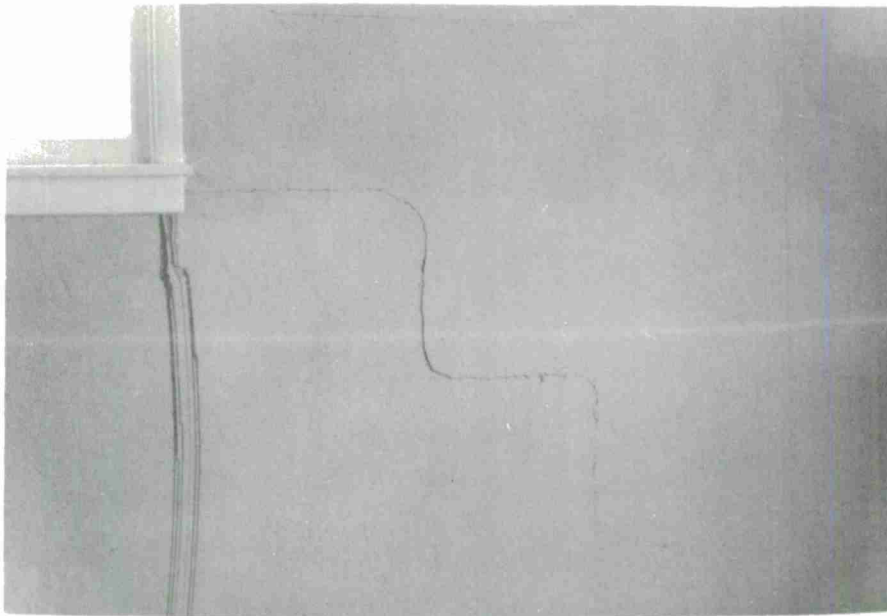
Pretest Plaster Cracks, Kitchen North Wall (vertical marks are water stains, not cracks)
